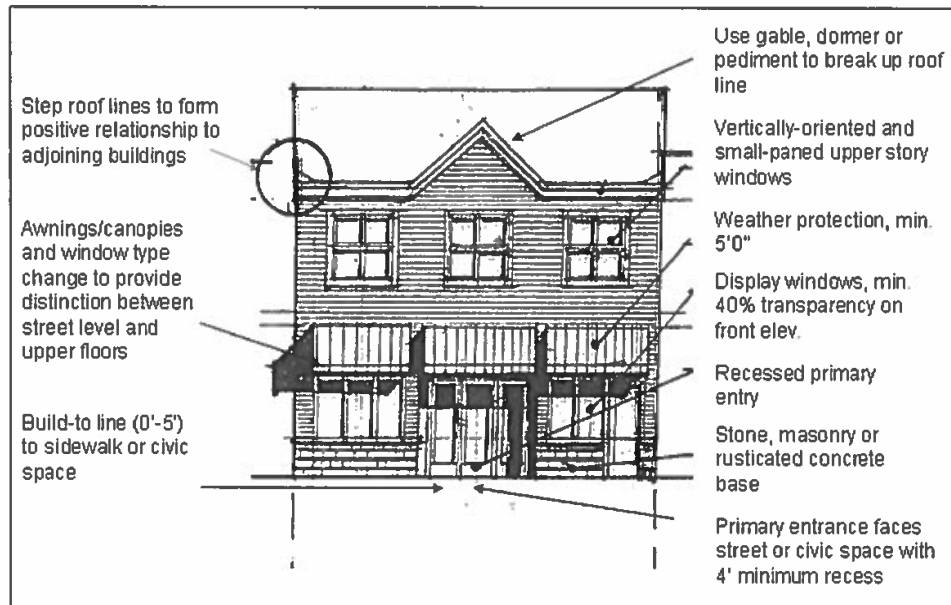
A: Typical Building Elements in Historic Roadside Commercial (Roadside Building Style)
